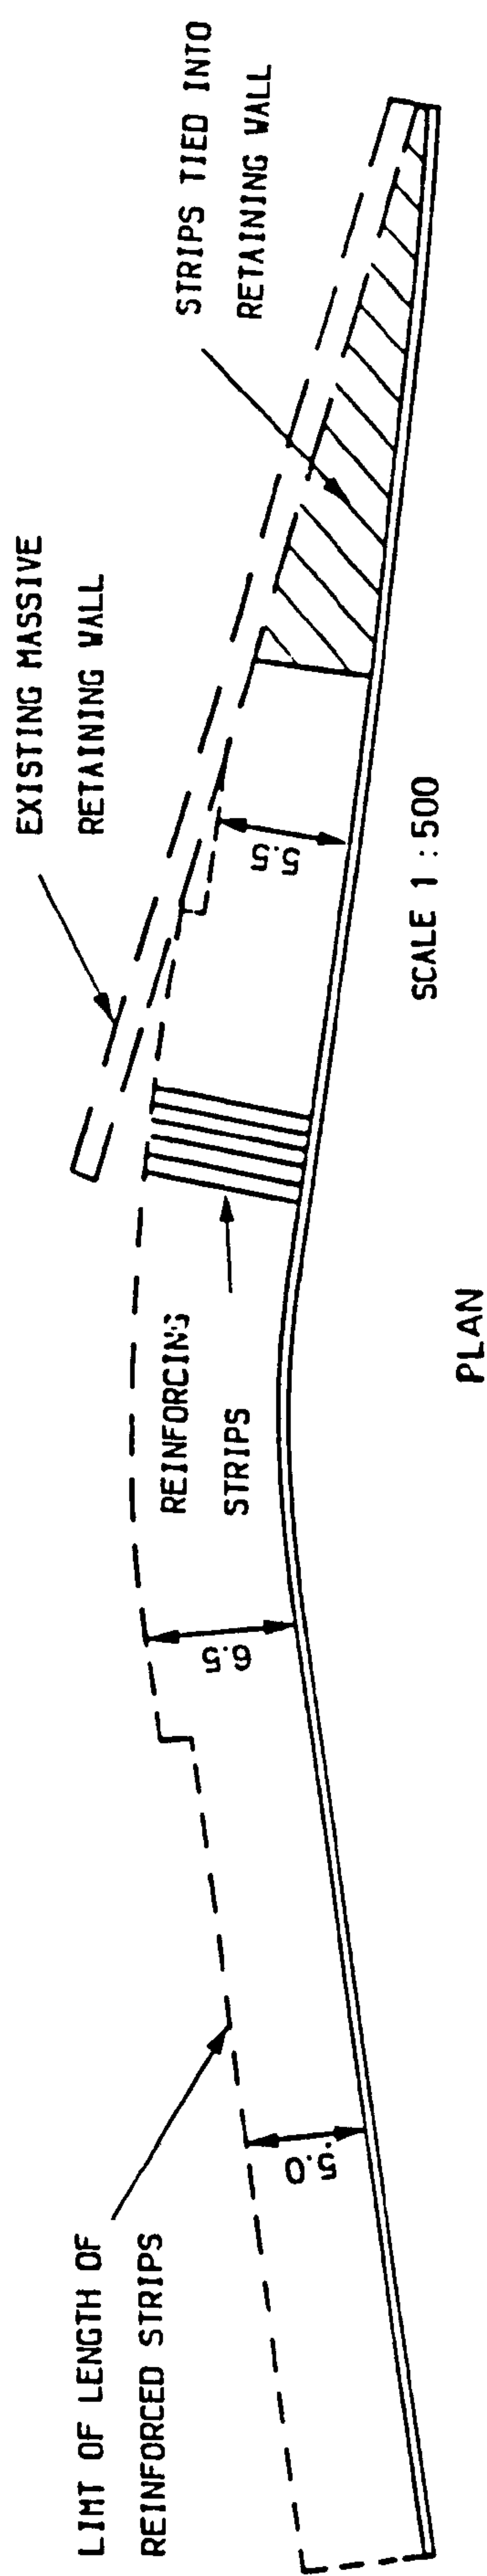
REINFORCED EARTH WALL AT GRANTON IN U.K. (AFTER FINLAY, 1977).
